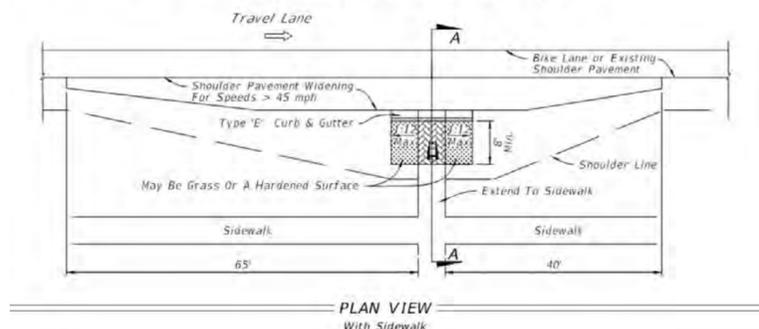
Accessible Boarding and Alighting Area for Flush Shoulder Roadways with Connection to Sidewalk
